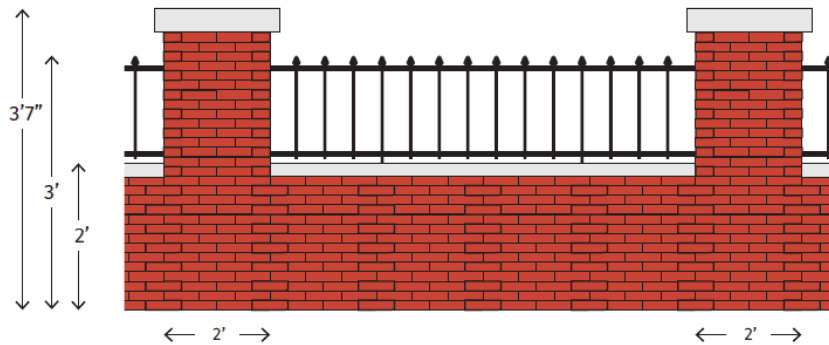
3 Foot Wall/Fence Along SW Stafford Road
